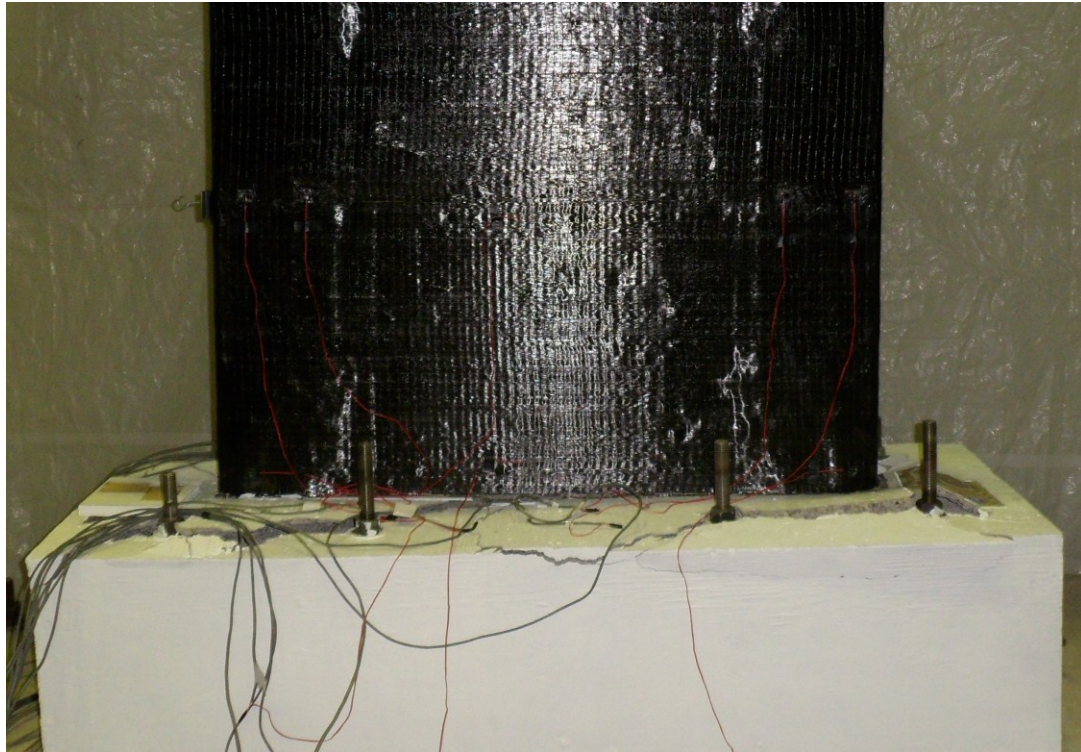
Failure of the FRP-retrofitted wall RW1.
